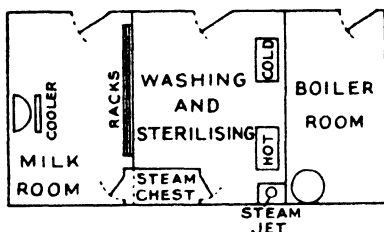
SKETCH PLAN OF DAIRY, GIVING POSITIONS OF PLANT.
